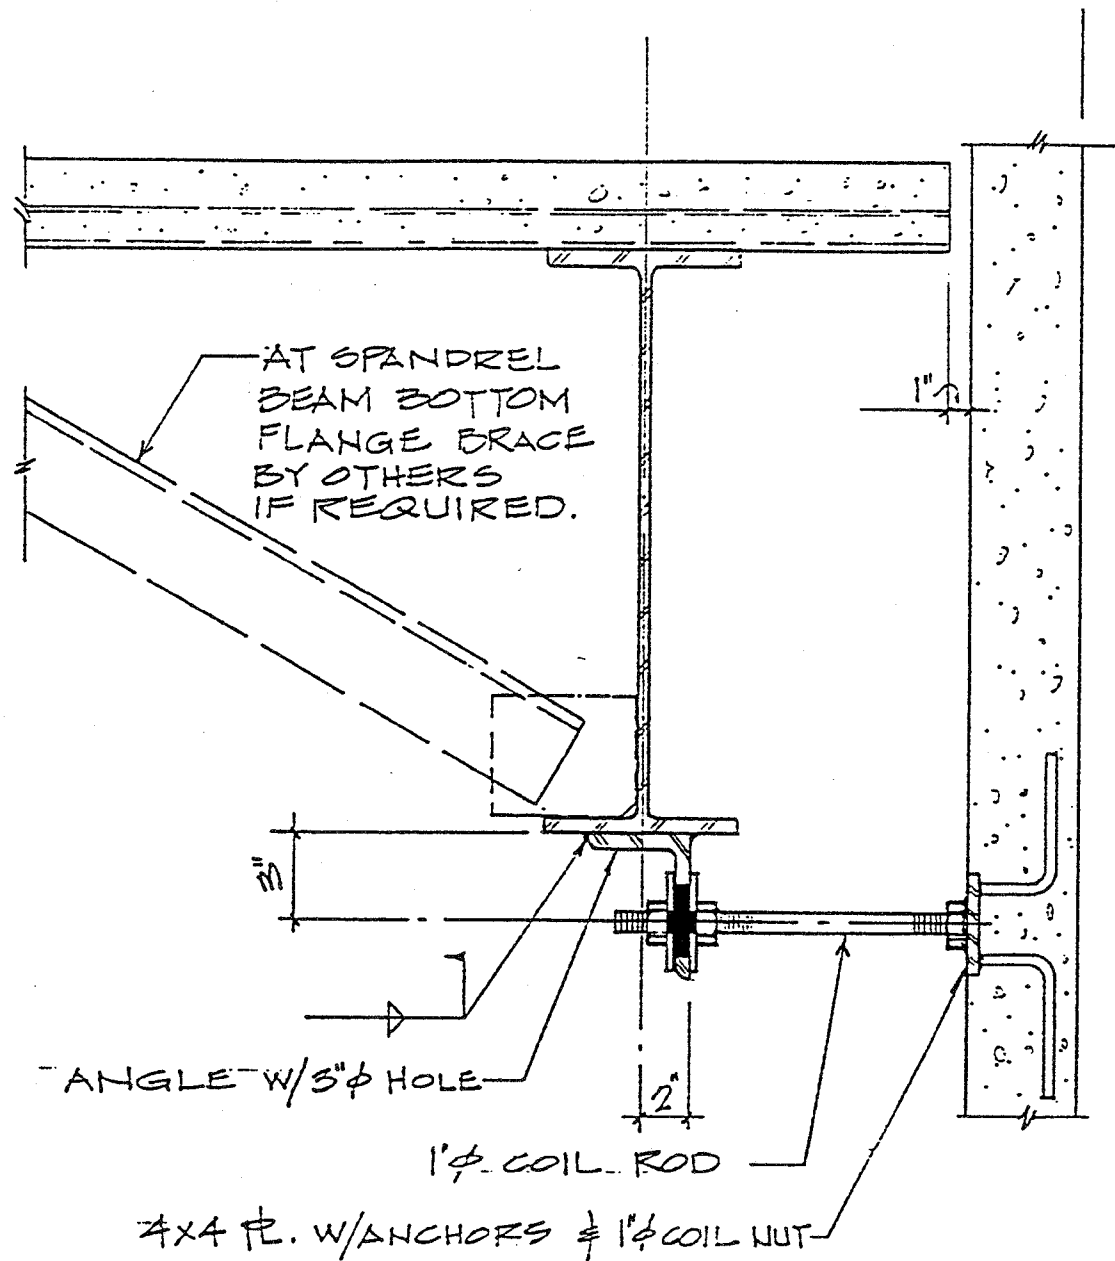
Lateral connection to beam or column (after Hegle [1989]).
